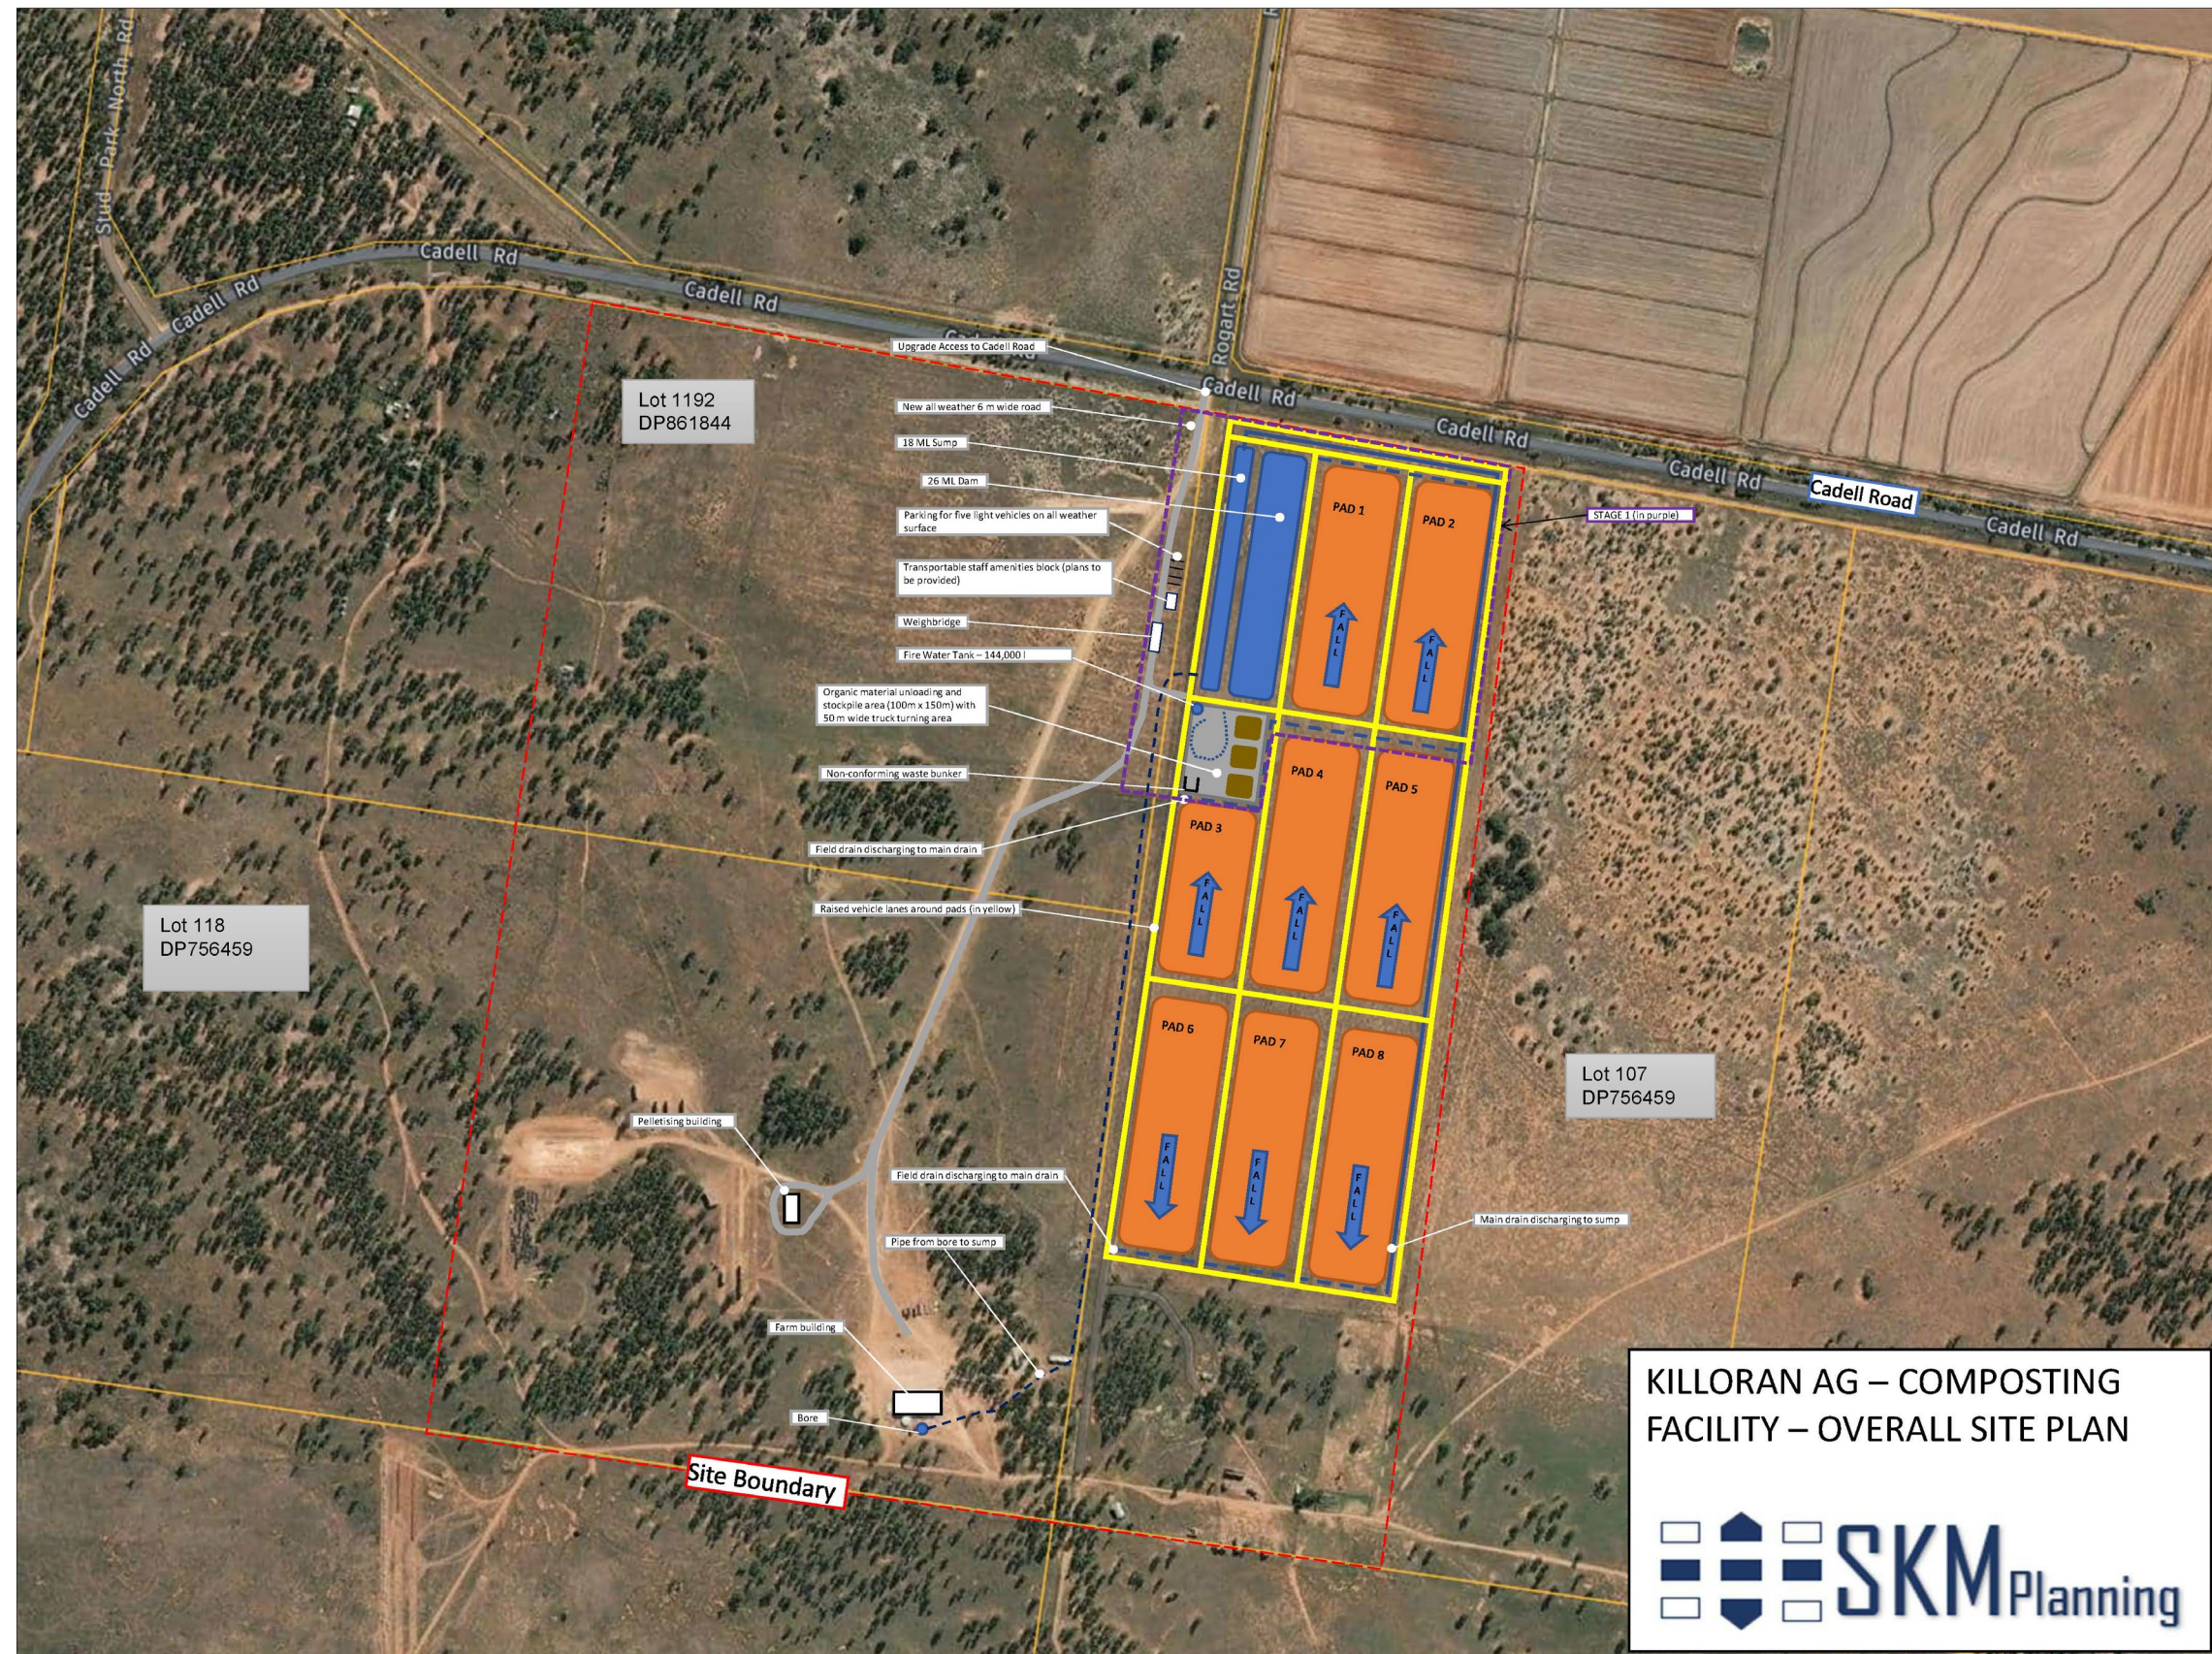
Overall Site Plan (Larger Version provided at Appendix 1)
